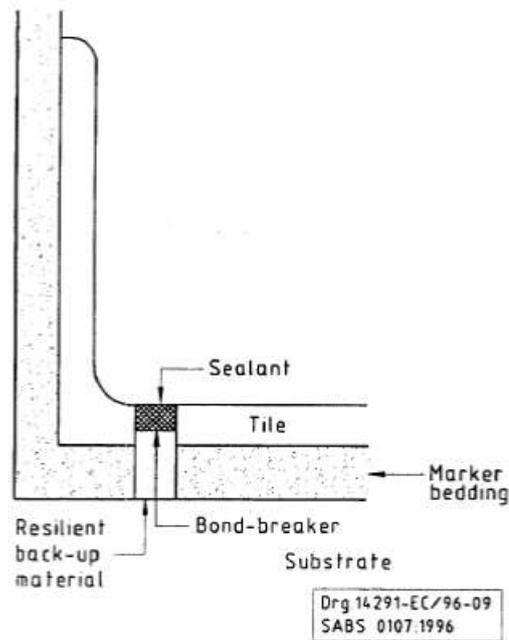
(a) — Perimeter joint between skirting and floor tiling (see also figure A.1, Type G)
